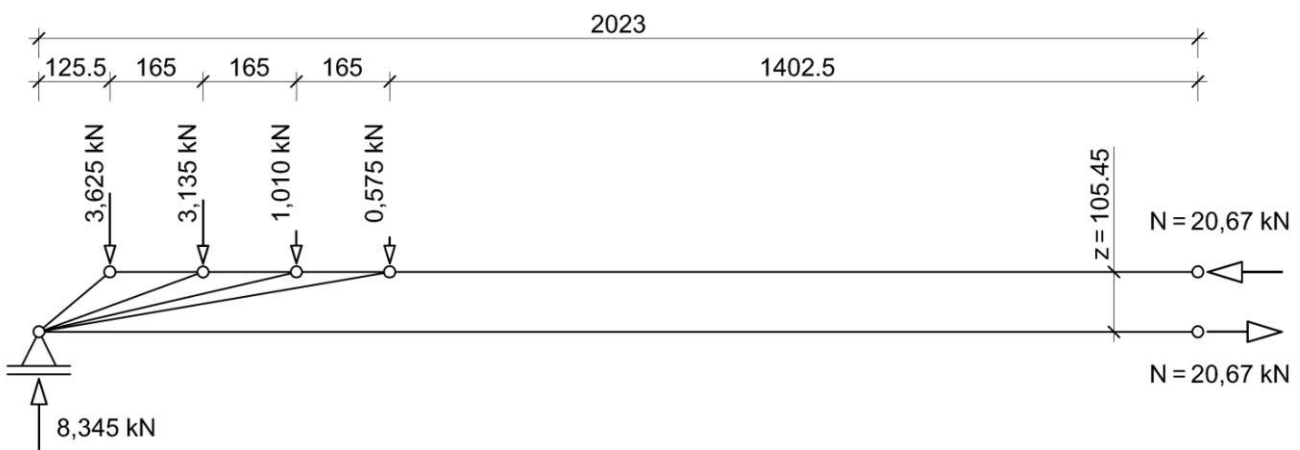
Truss frame model for the concrete next to the outside shear connector. Dimensions in [mm]
